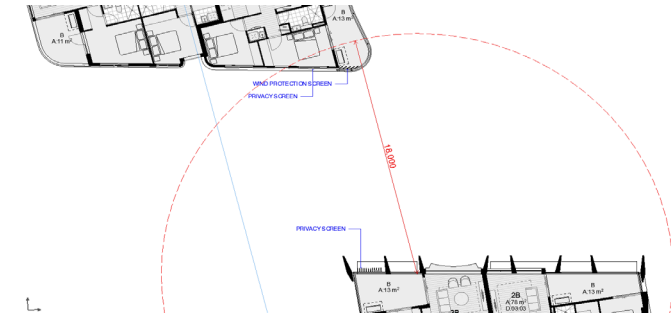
F1.2 Building D-E separation (storeys 3-9) & Key Plan
